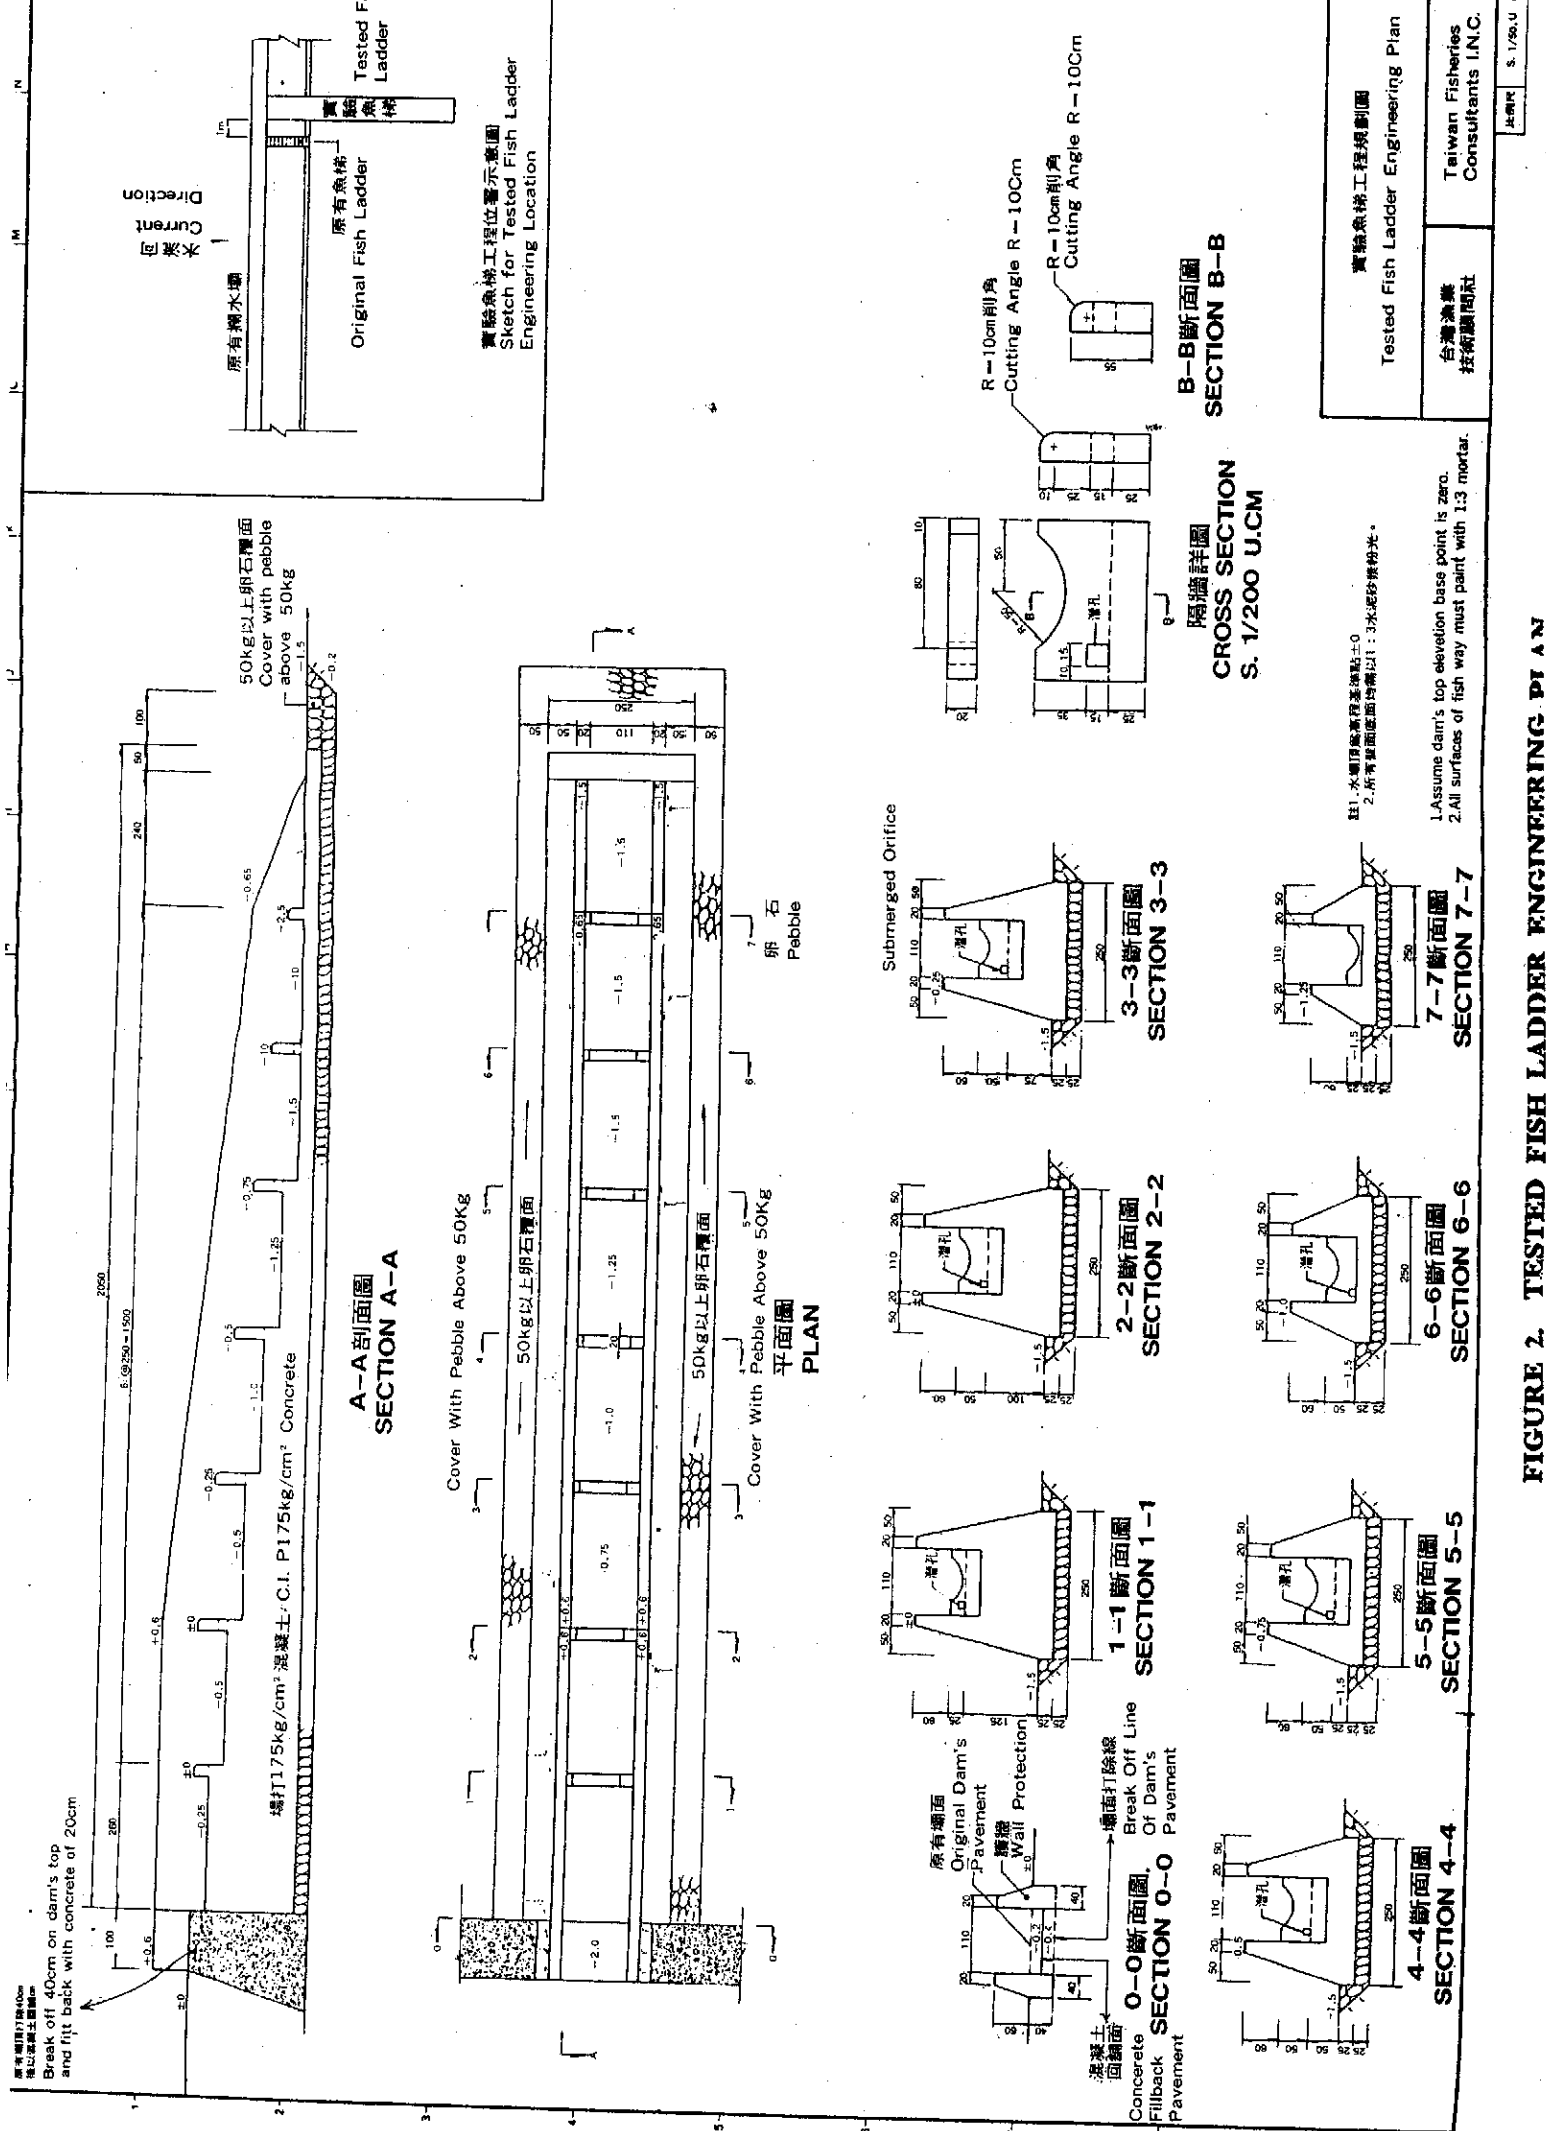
TESTED FISH LADDER ENGINEERING PLAN
